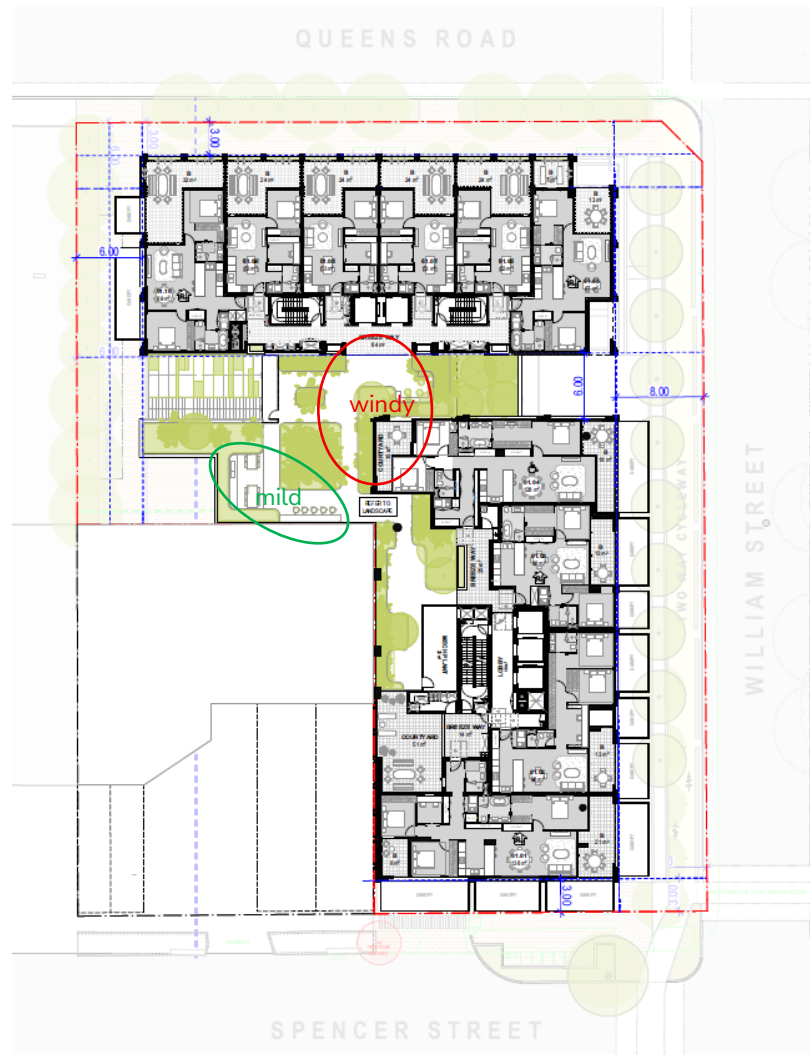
Level 1 floor plan (Plus Studio, 2026)
